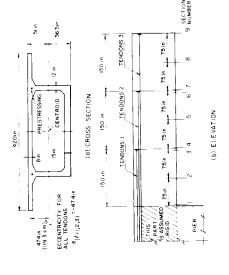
Cantilever Box-Girder Bridge Example (1 in. = 25.4 mm)
